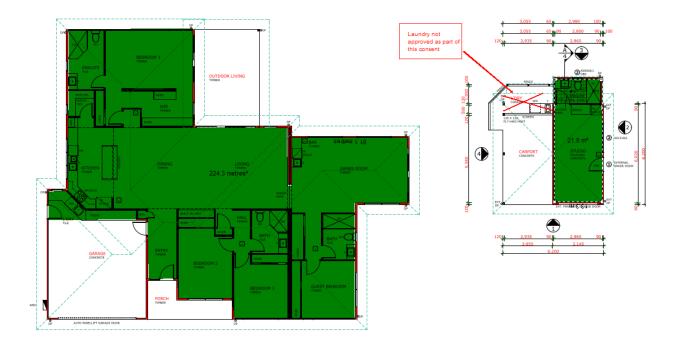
Extract of floor plan showing area of dwelling and studio used to calculate the floor space ratio.
